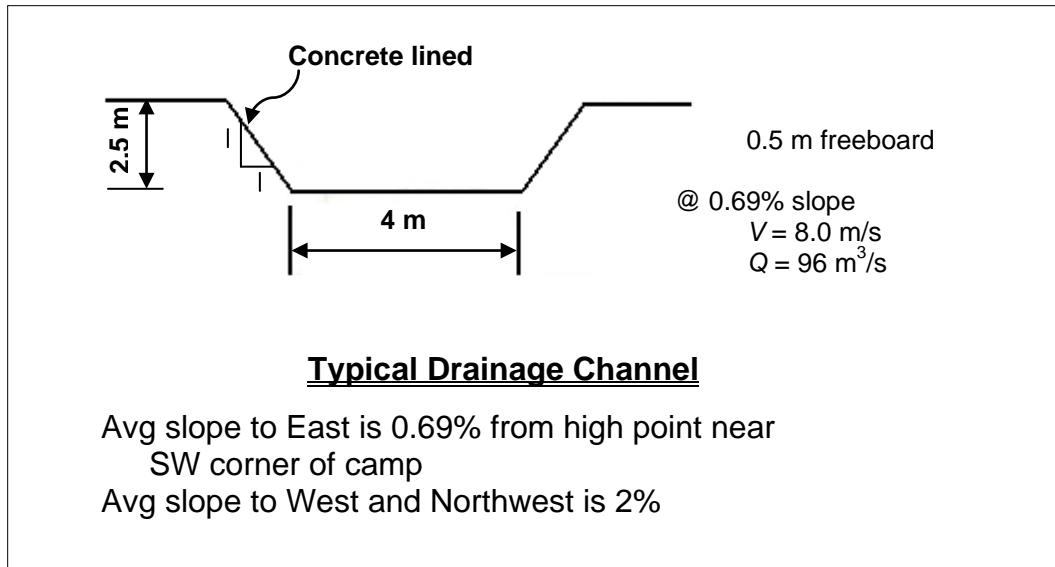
TAN typical drainage channel detail for Camp Marmal's ditch extension.
